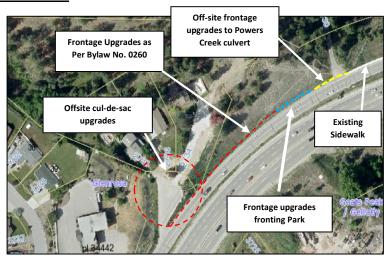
Cul-de-Sac and Proposed Sidewalk Extension Lower Glenrosa
